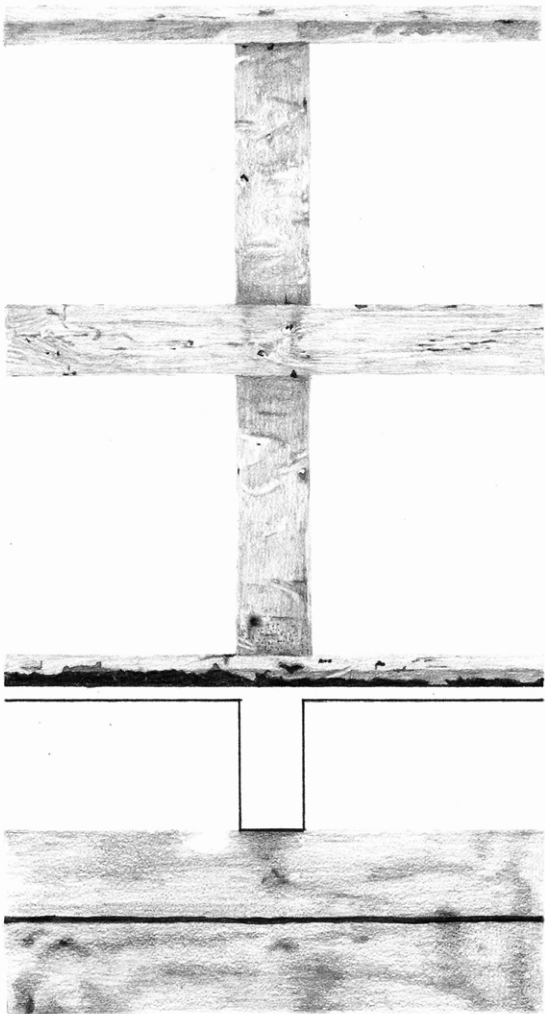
Fence post no. 2 on the north western facade drawn in section, elevation and plan at 1:10. Pencil drawing on cartridge, Gothenburg, February 2025.
